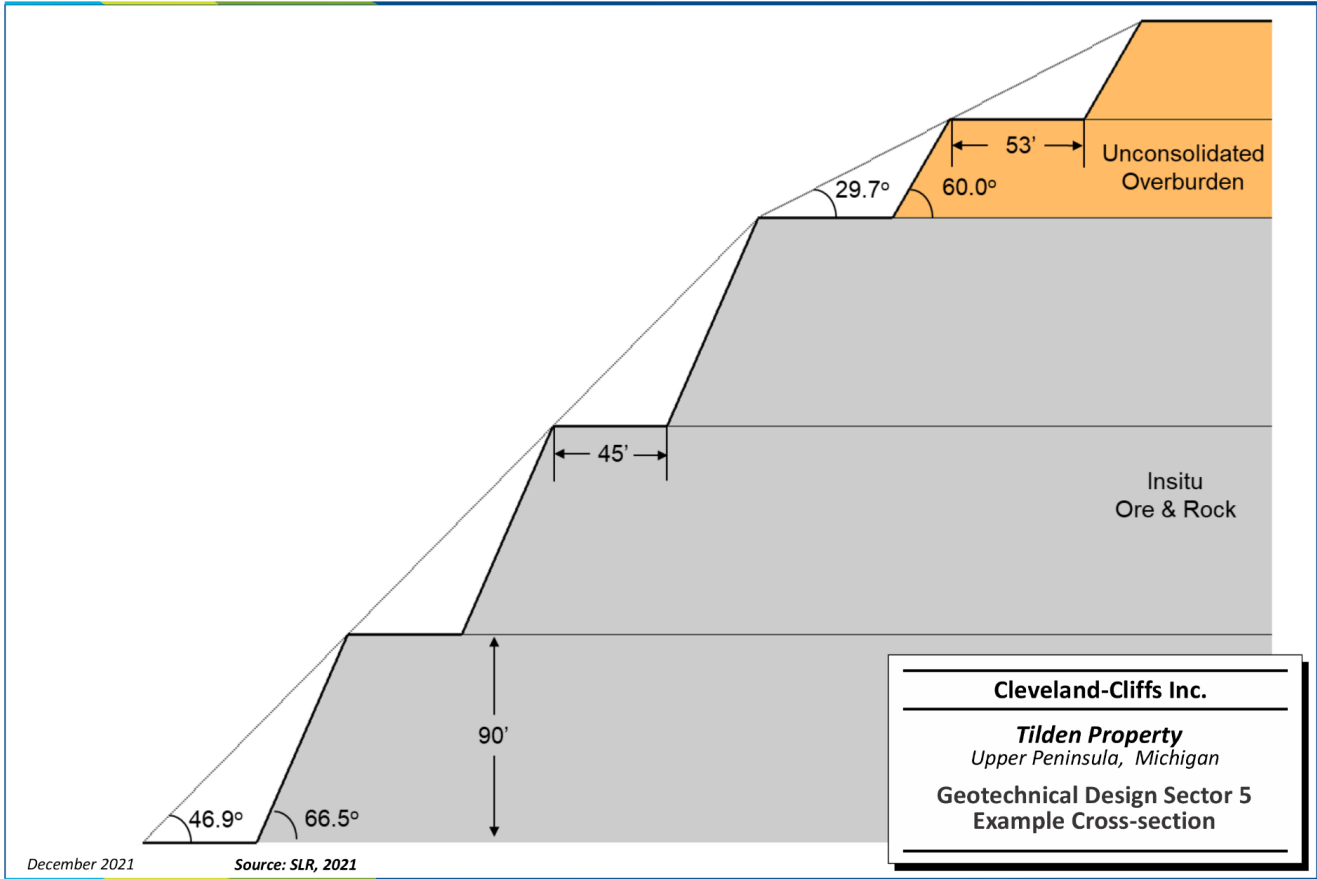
Geotechnical Design Sector 5 Example Cross-section
